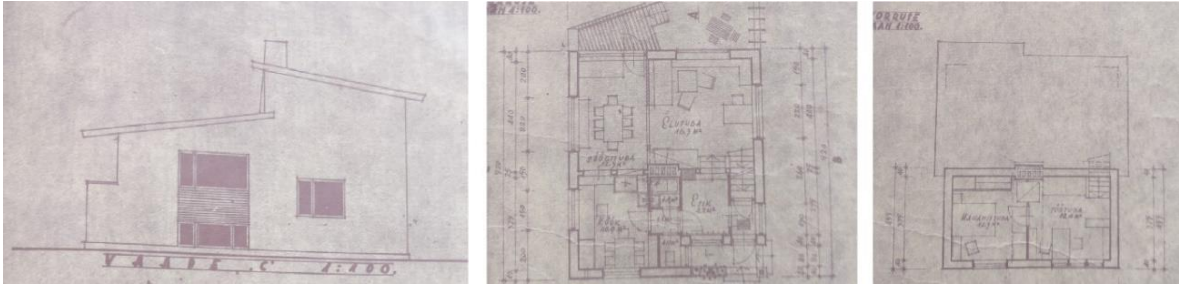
Project 68, an example of a partly two-floored dwelling from 1965 (left to right: elevation; ground floor; upper floor) (RPI Estonprojekt, 1965)
